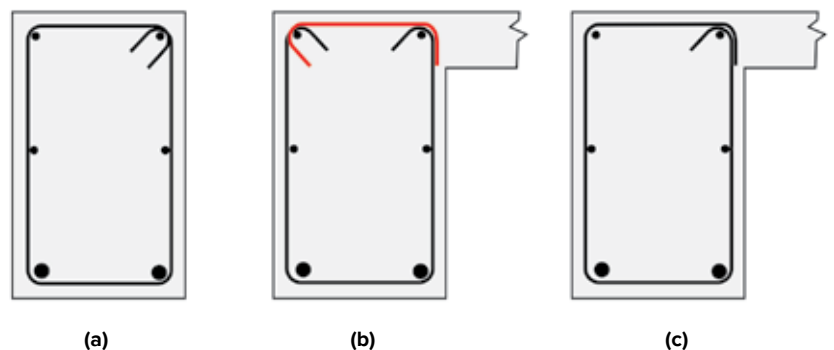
Torsion reinforcement in a beam: (a) hoop; (b) two-part closed stirrup restrained by slab; and (c) one-part closed stirrup restrained by slab (for clarity, the slab reinforcement is not shown)
